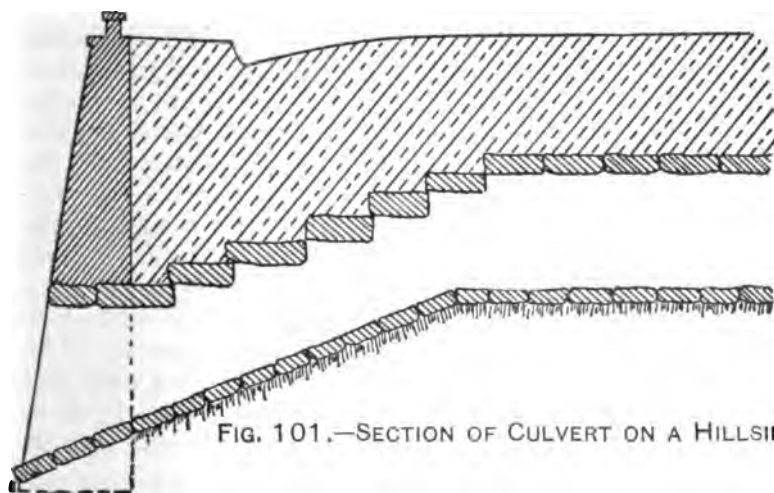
SECTION OF CULVERT ON A HILLSIDE.
